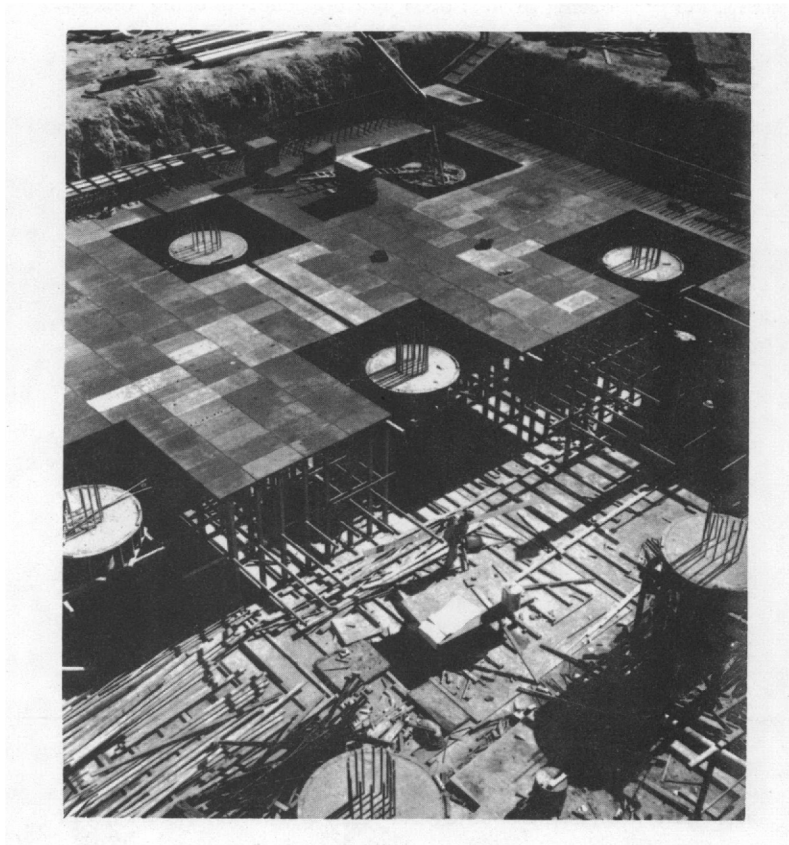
Aerial view of structure while erecting roof-slab formwork.
